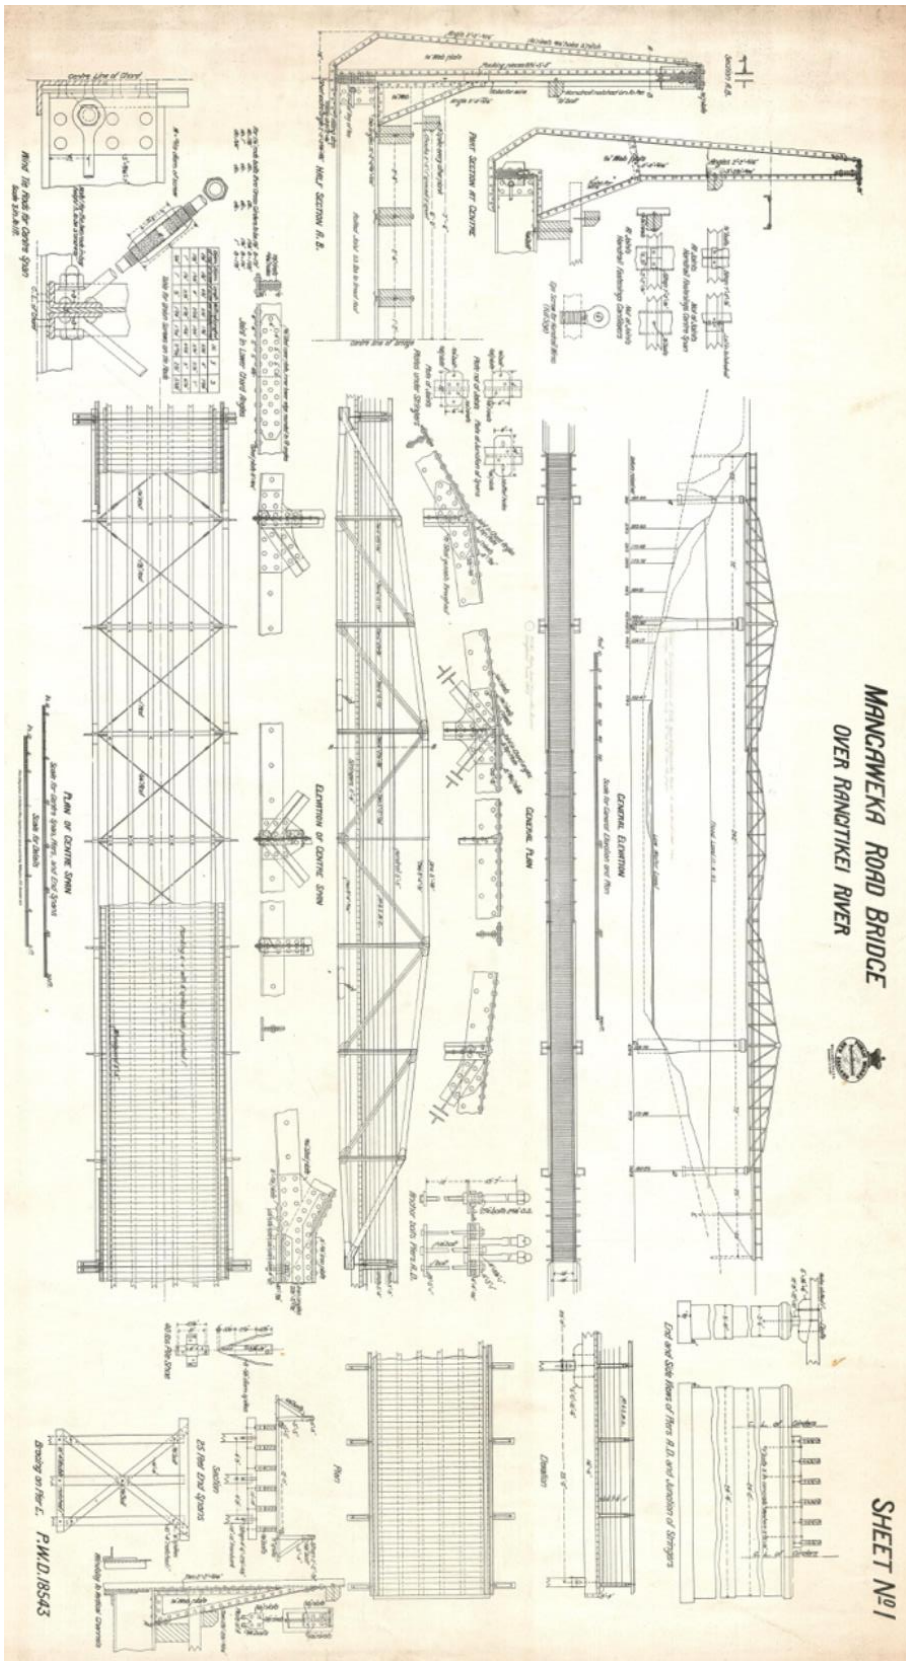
Plans for the cantilever truss bridge, dated 1899 (MDC archives)
